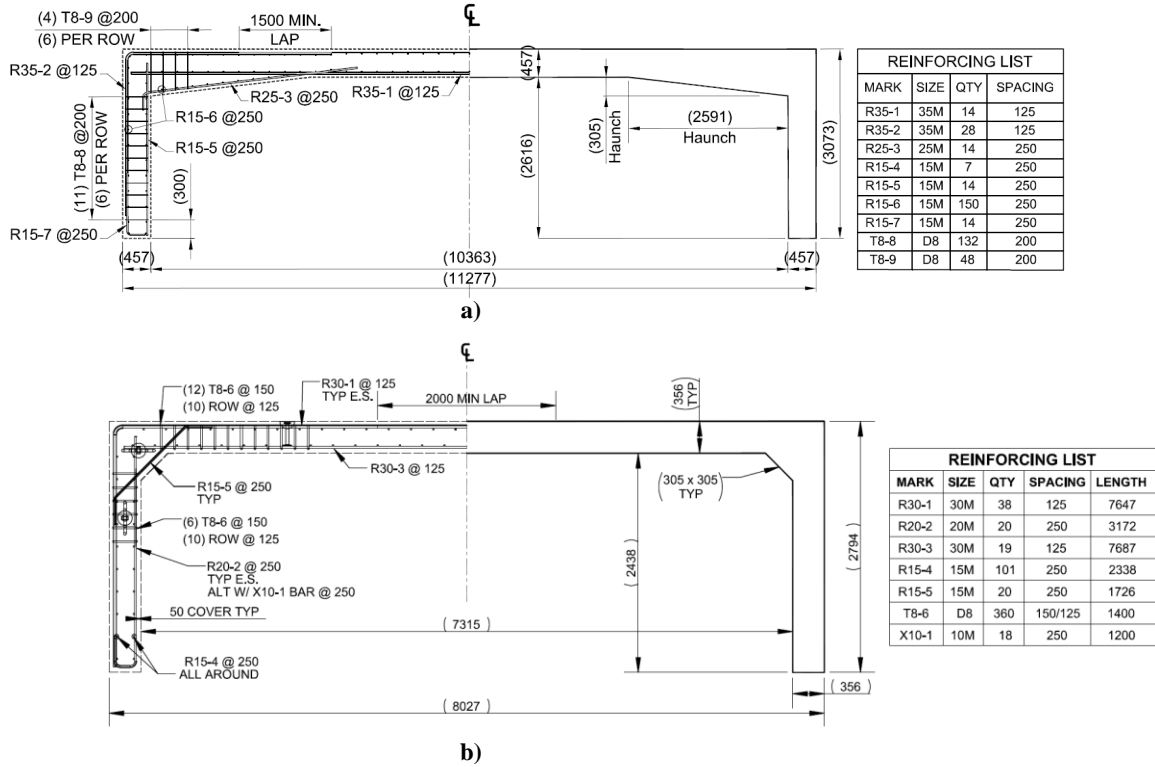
Geometry and reinforcement details: a) Pickering culvert; and b) Remembrance culvert. (Not to scale)
